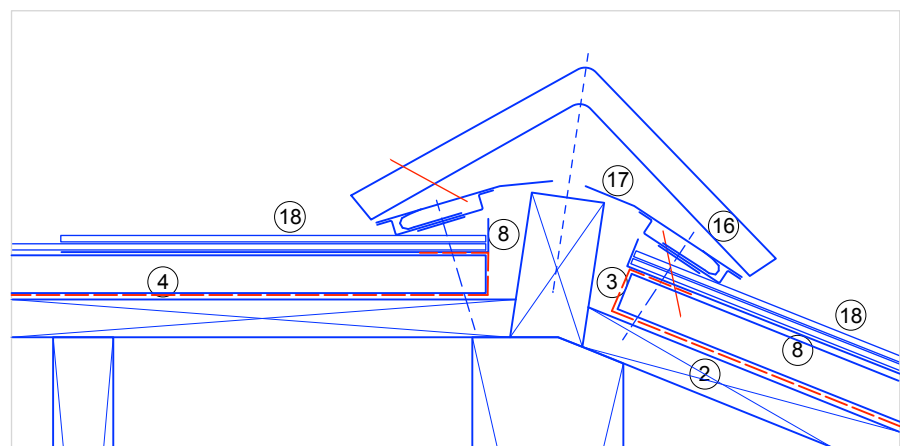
, SECTION THROUGH ABUTMENT VENTILATION scale 1:5
